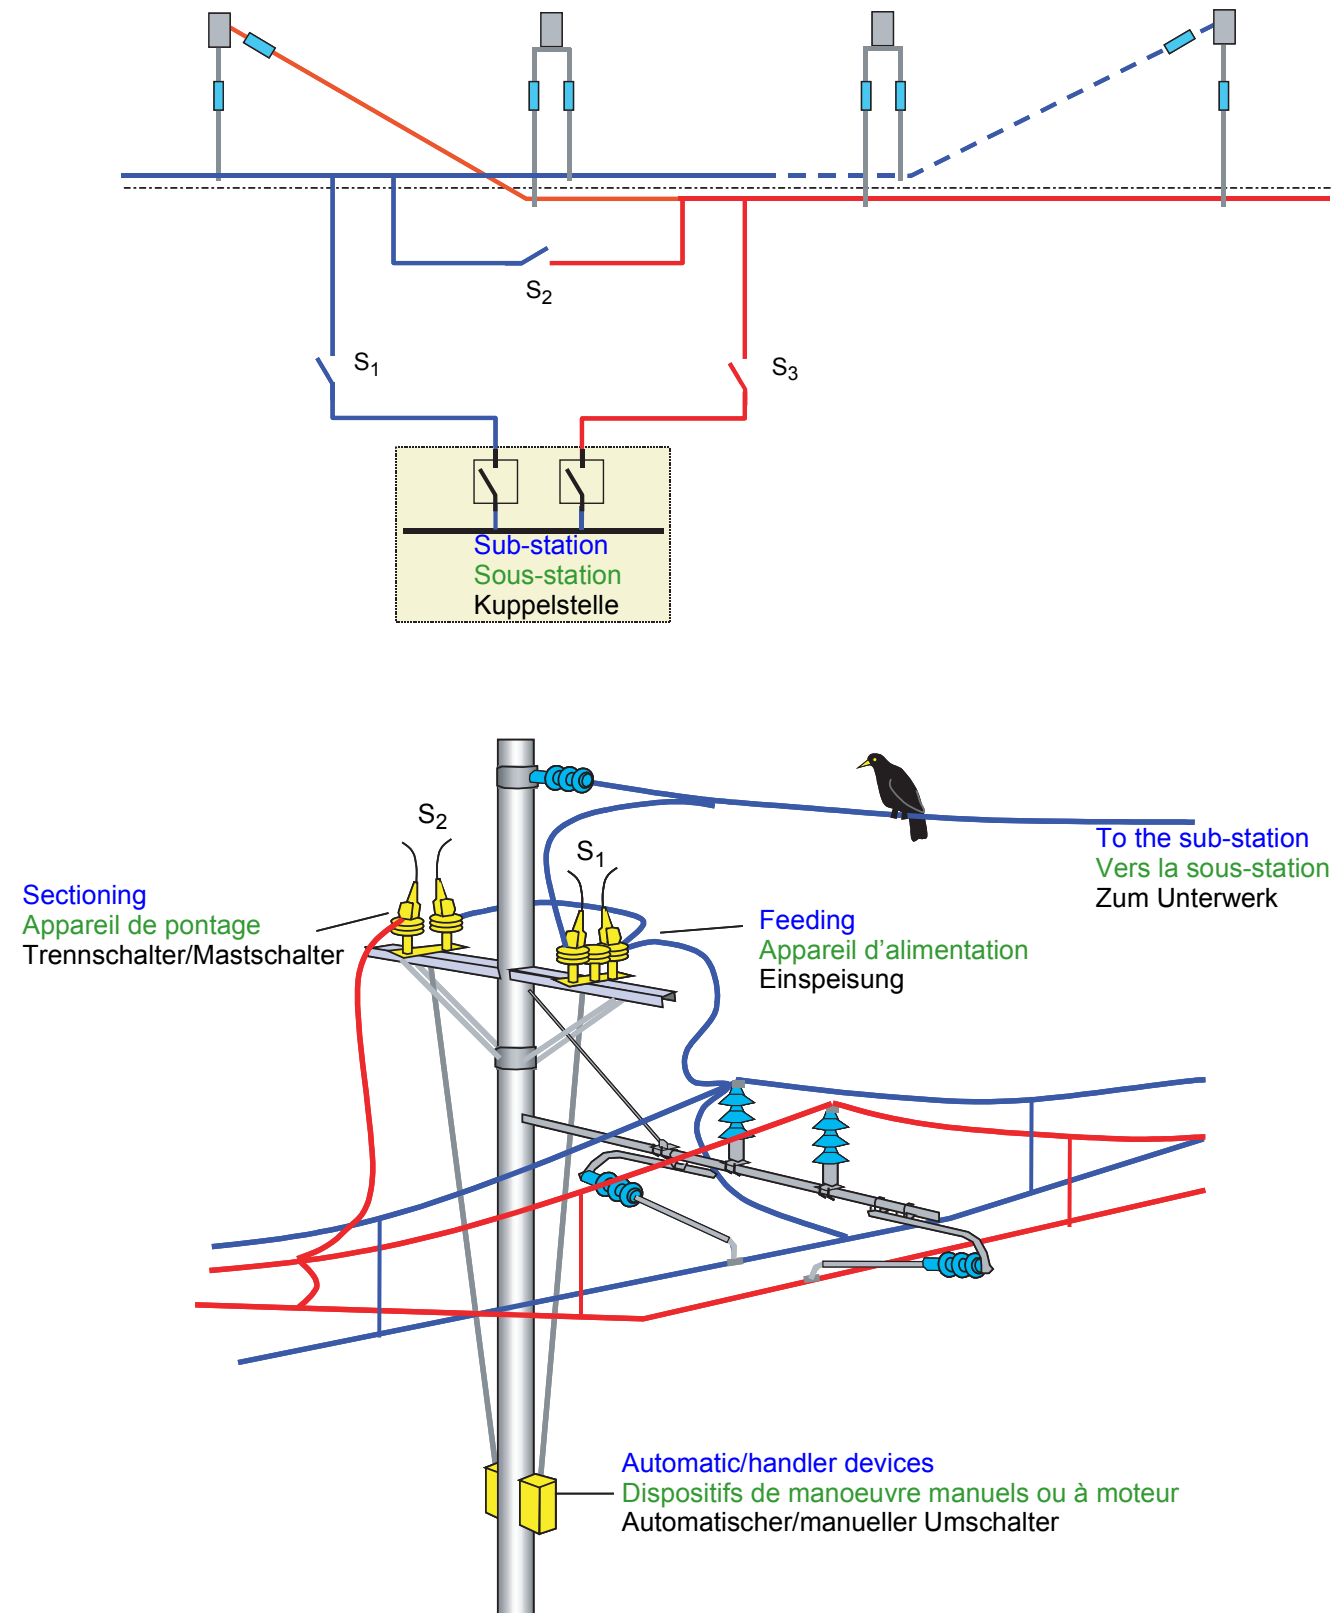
Sectioning and feeding point - Pontage et alimentation - Trennstelle und Speisepunkt
